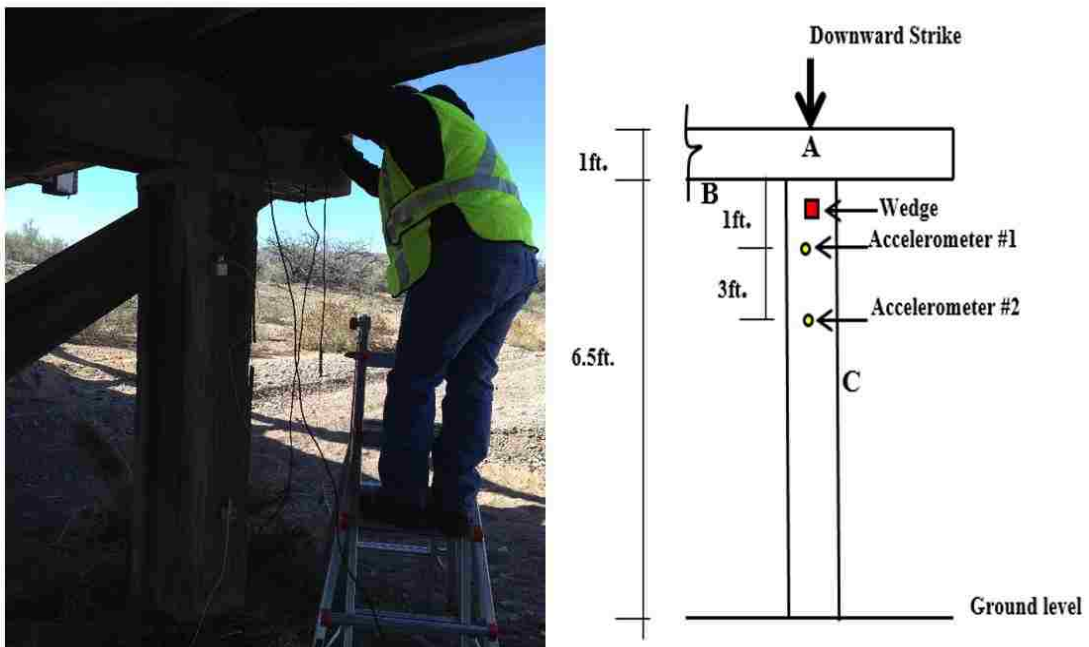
The Image of Pile C-1 and SE Test Setup
